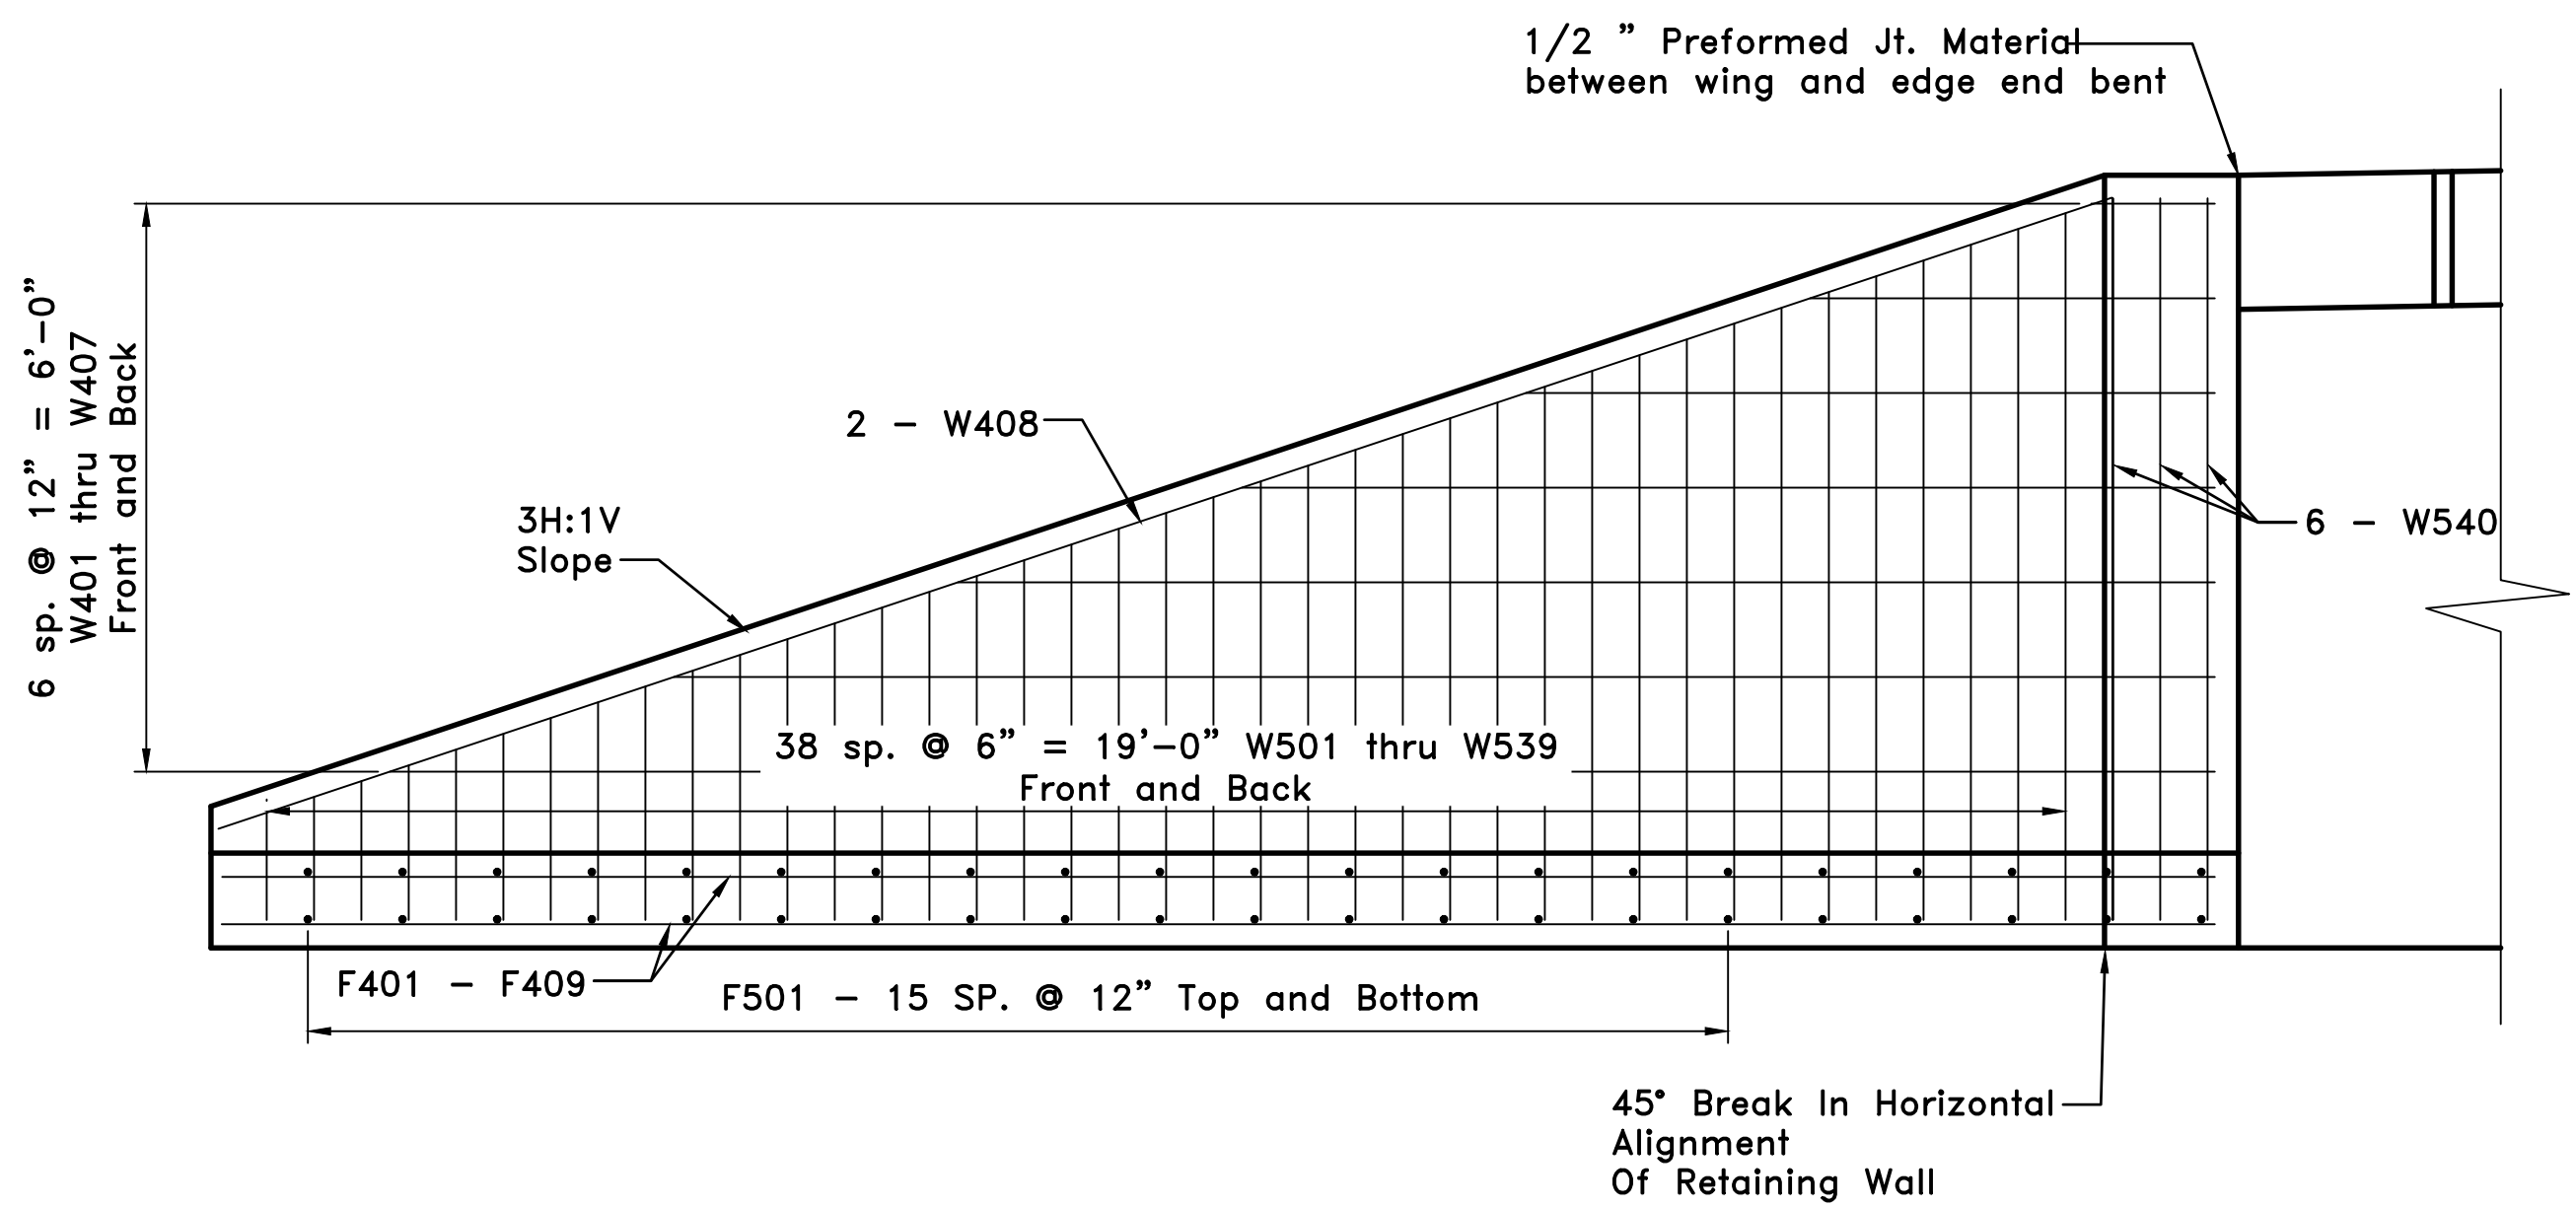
DETAILS OF STANDARD 25'-0" PRECAST CONCRETE SPANS 28'-0" & 24'-6" CLEAR ROADWAYS
